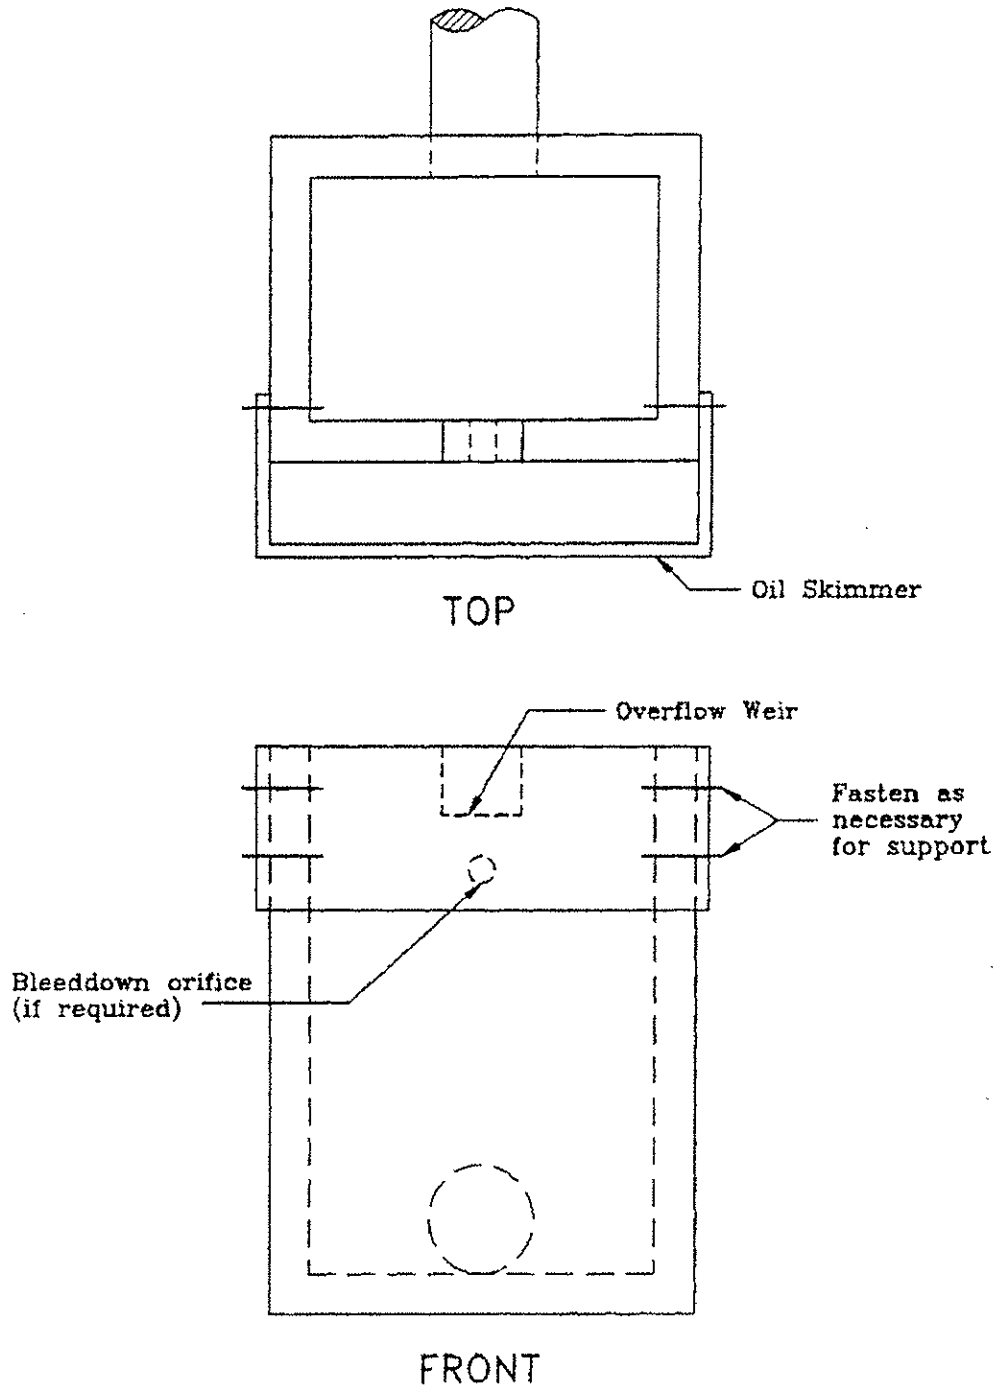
Oil skimmer detail for a typical outfall structure (N.T.S.)
